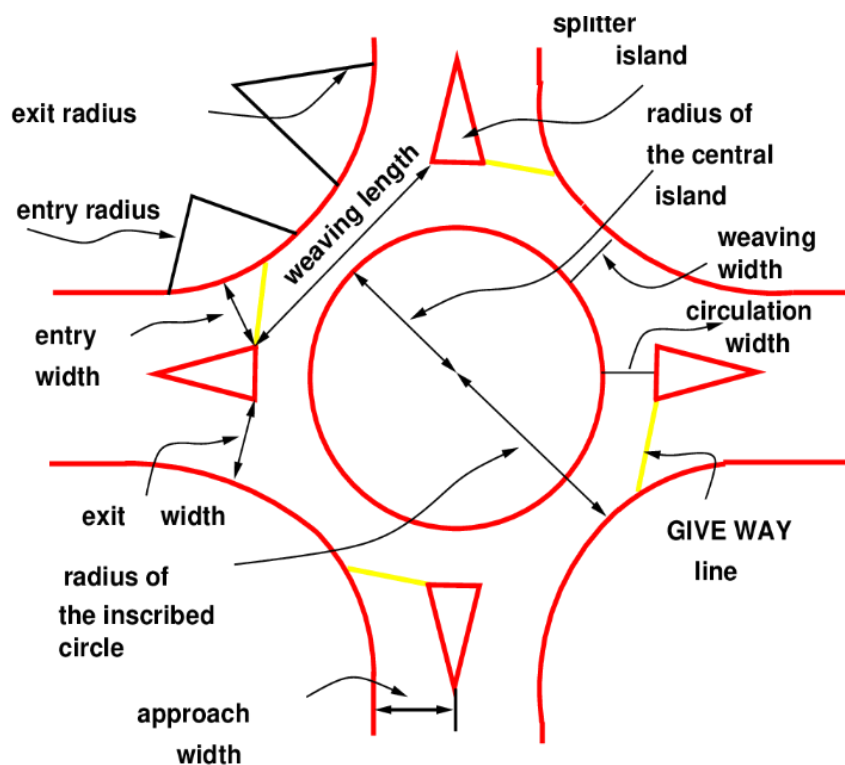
TYPICAL DRAWING OF ROTARY
